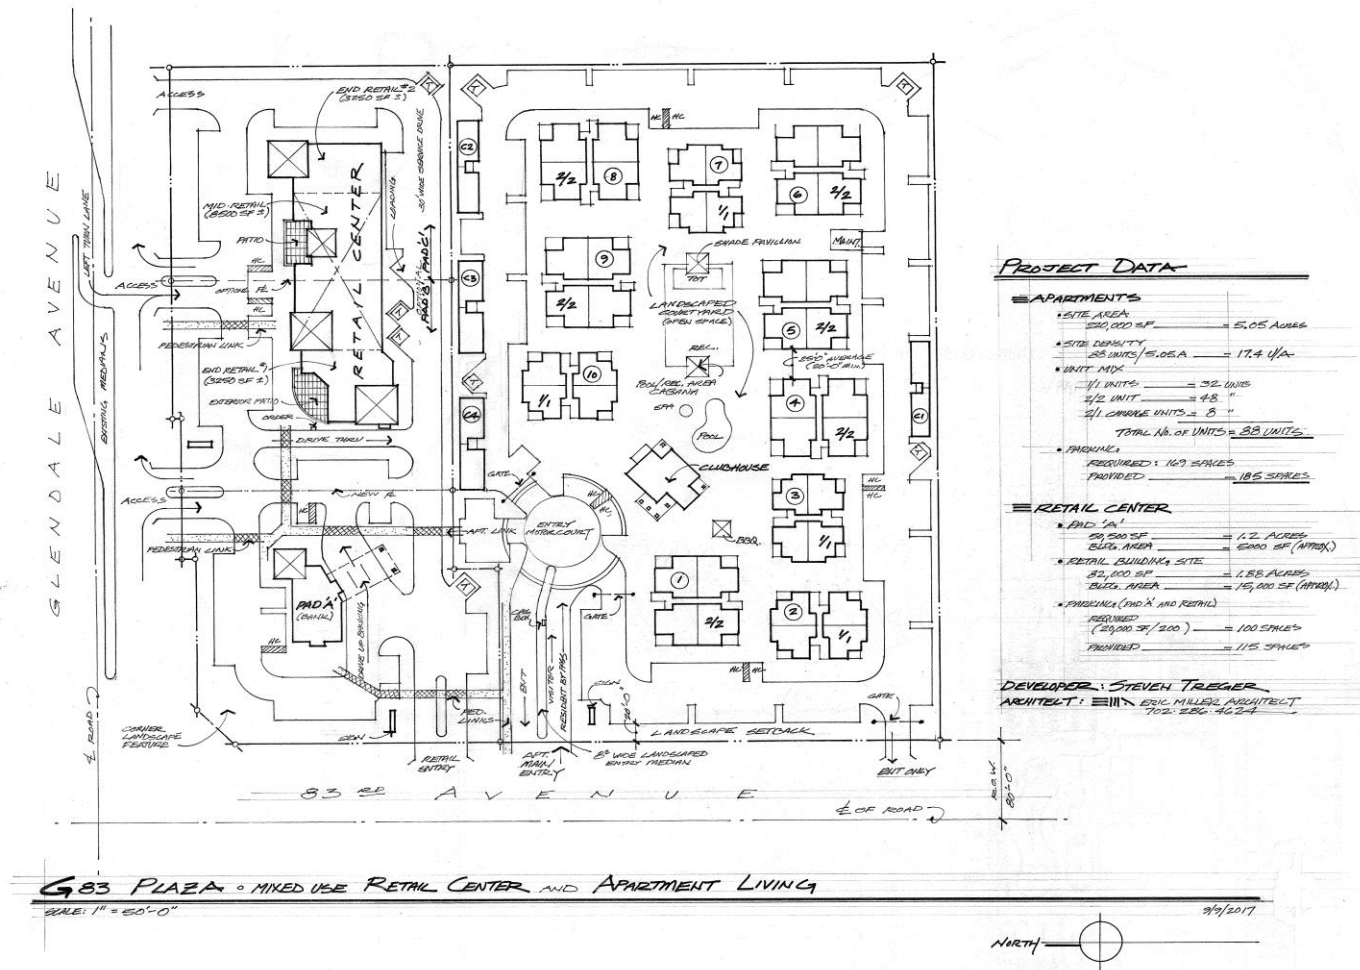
Exhibit D: Conceptual Site Plan (Subject to Design Review)
